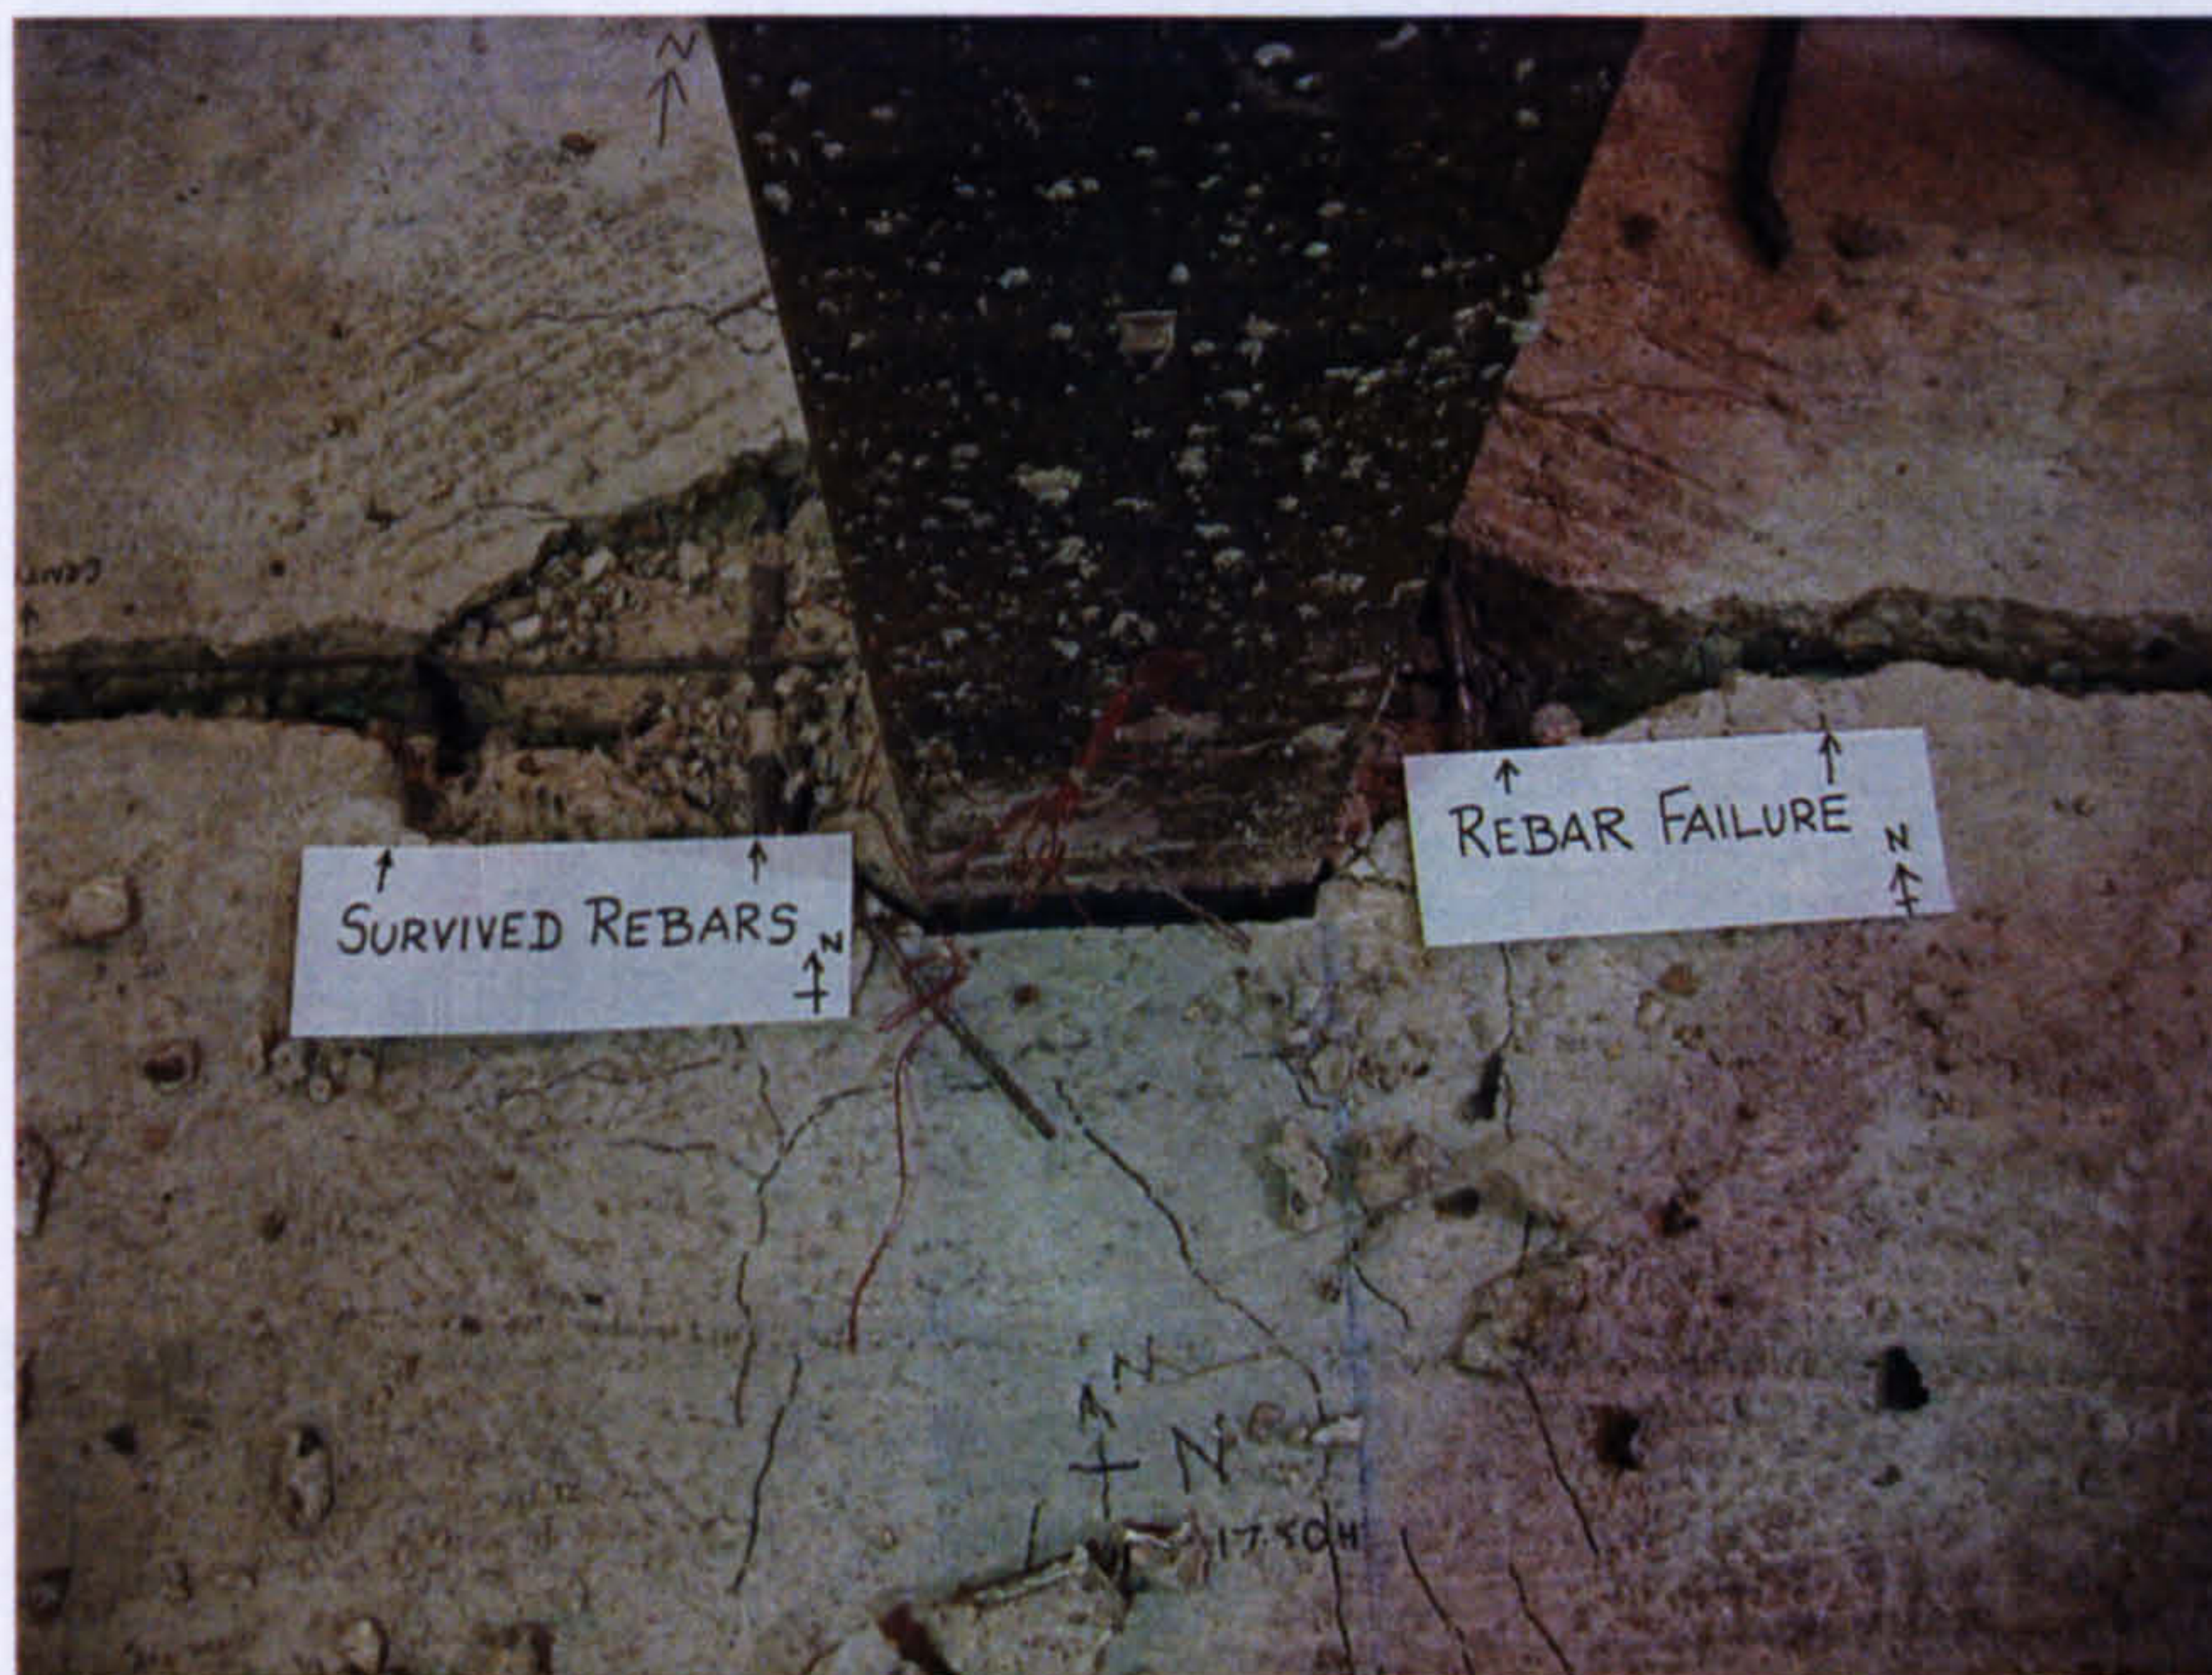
Cracks and rebar failure at the interior composite connection
